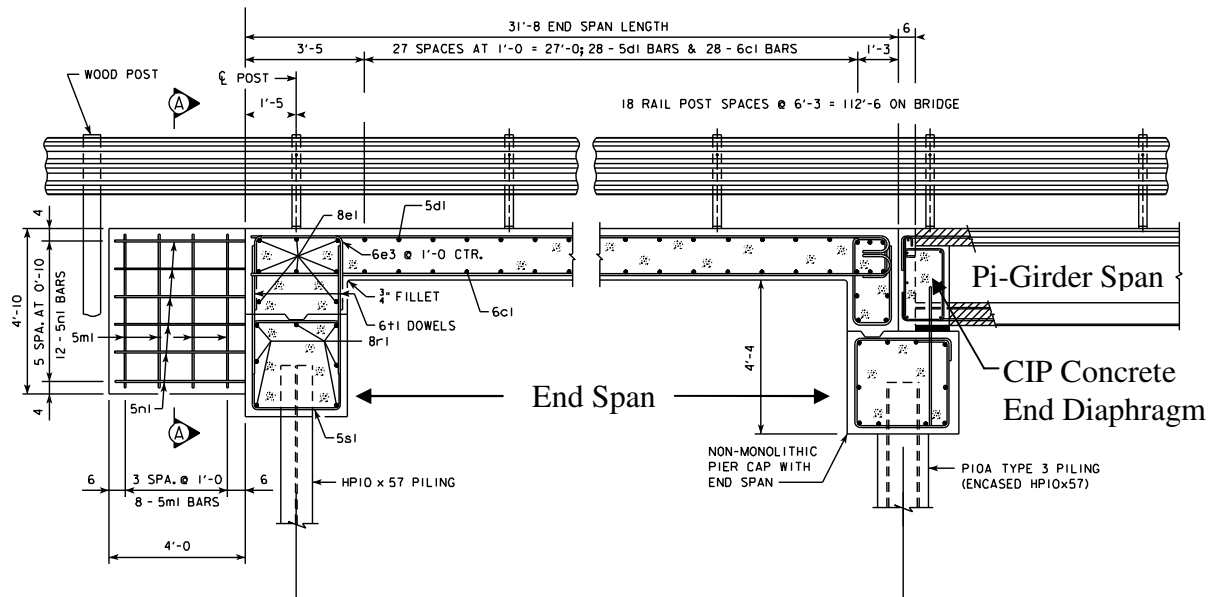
Elevation View of End Spans and Pier-(Keierleber, et al. 2008)
